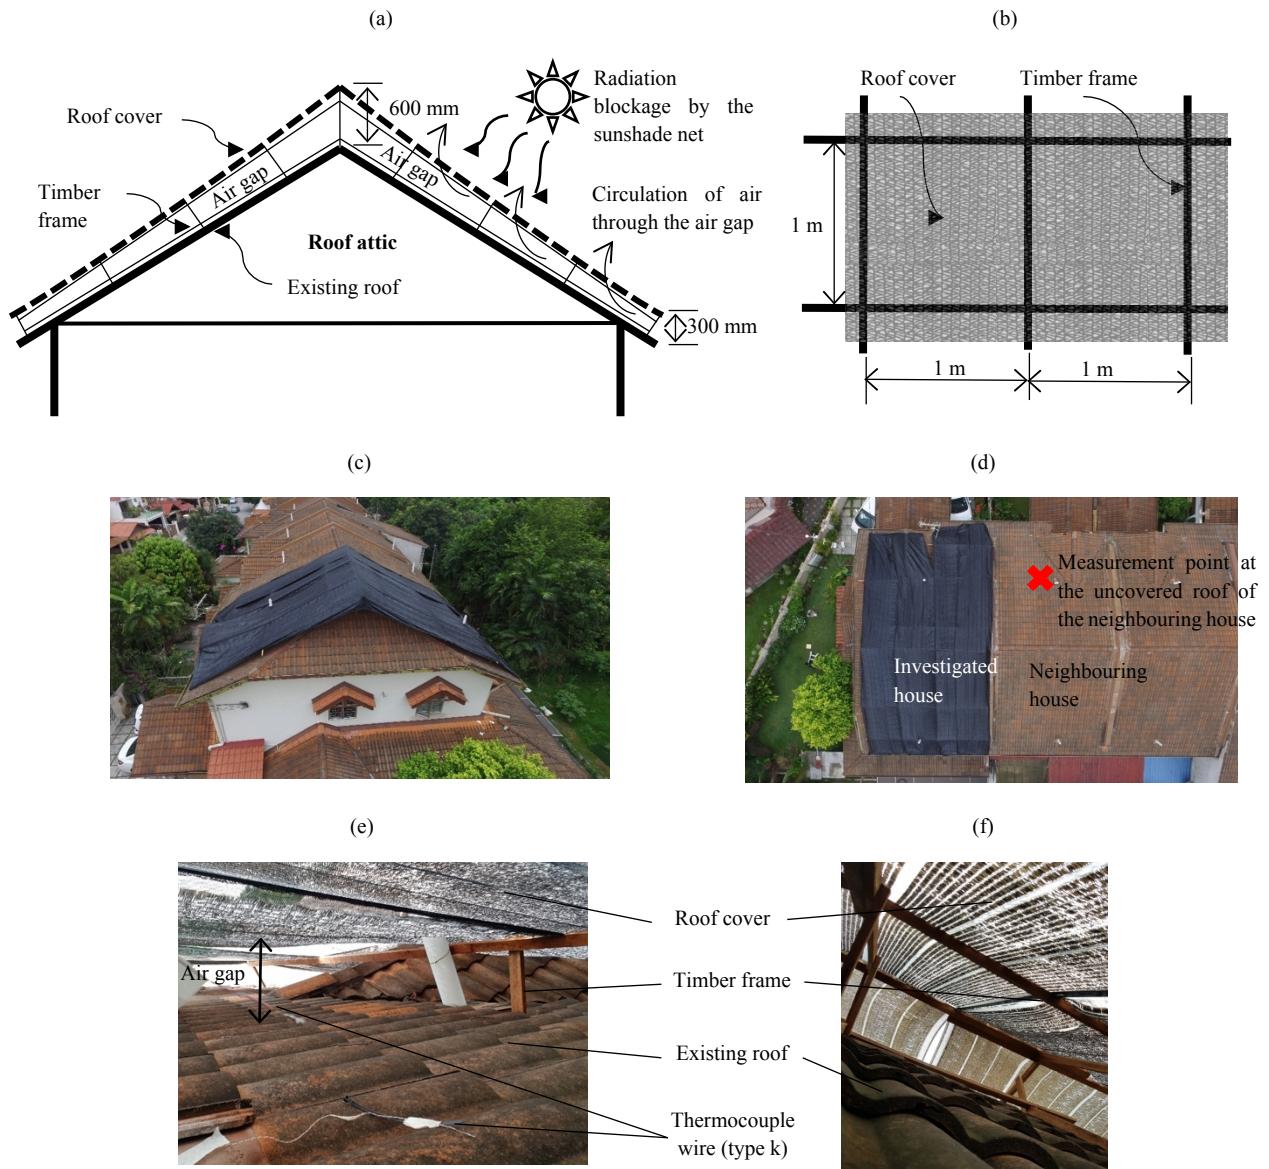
Installation of the roof cover on the existing roof and measurement setup. (a), (b) Schematics of the installation of the roof cover over the existing roof, (c) existing roof with the HDPE roof cover, (d) measurement point at the uncovered roof tiles of the neighbouring house, and (e), (f) measurement of the temperatures of the top surface of the roof tile and air between the roof cover and roof.
